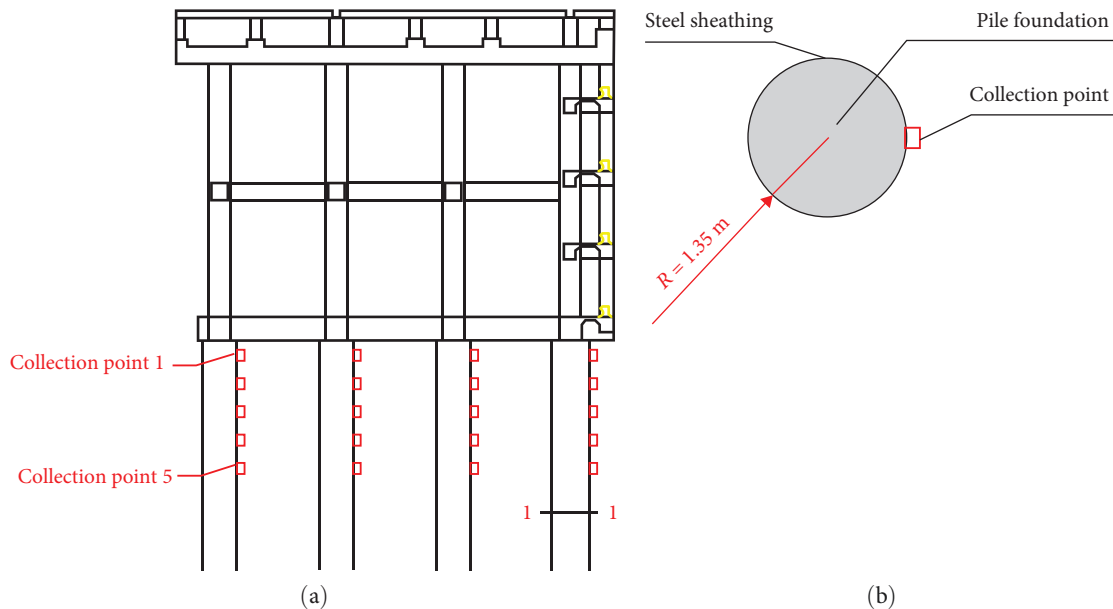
The layout of stress acquisition points: (a) side view of pier; (b) 1–1 cross-section.
